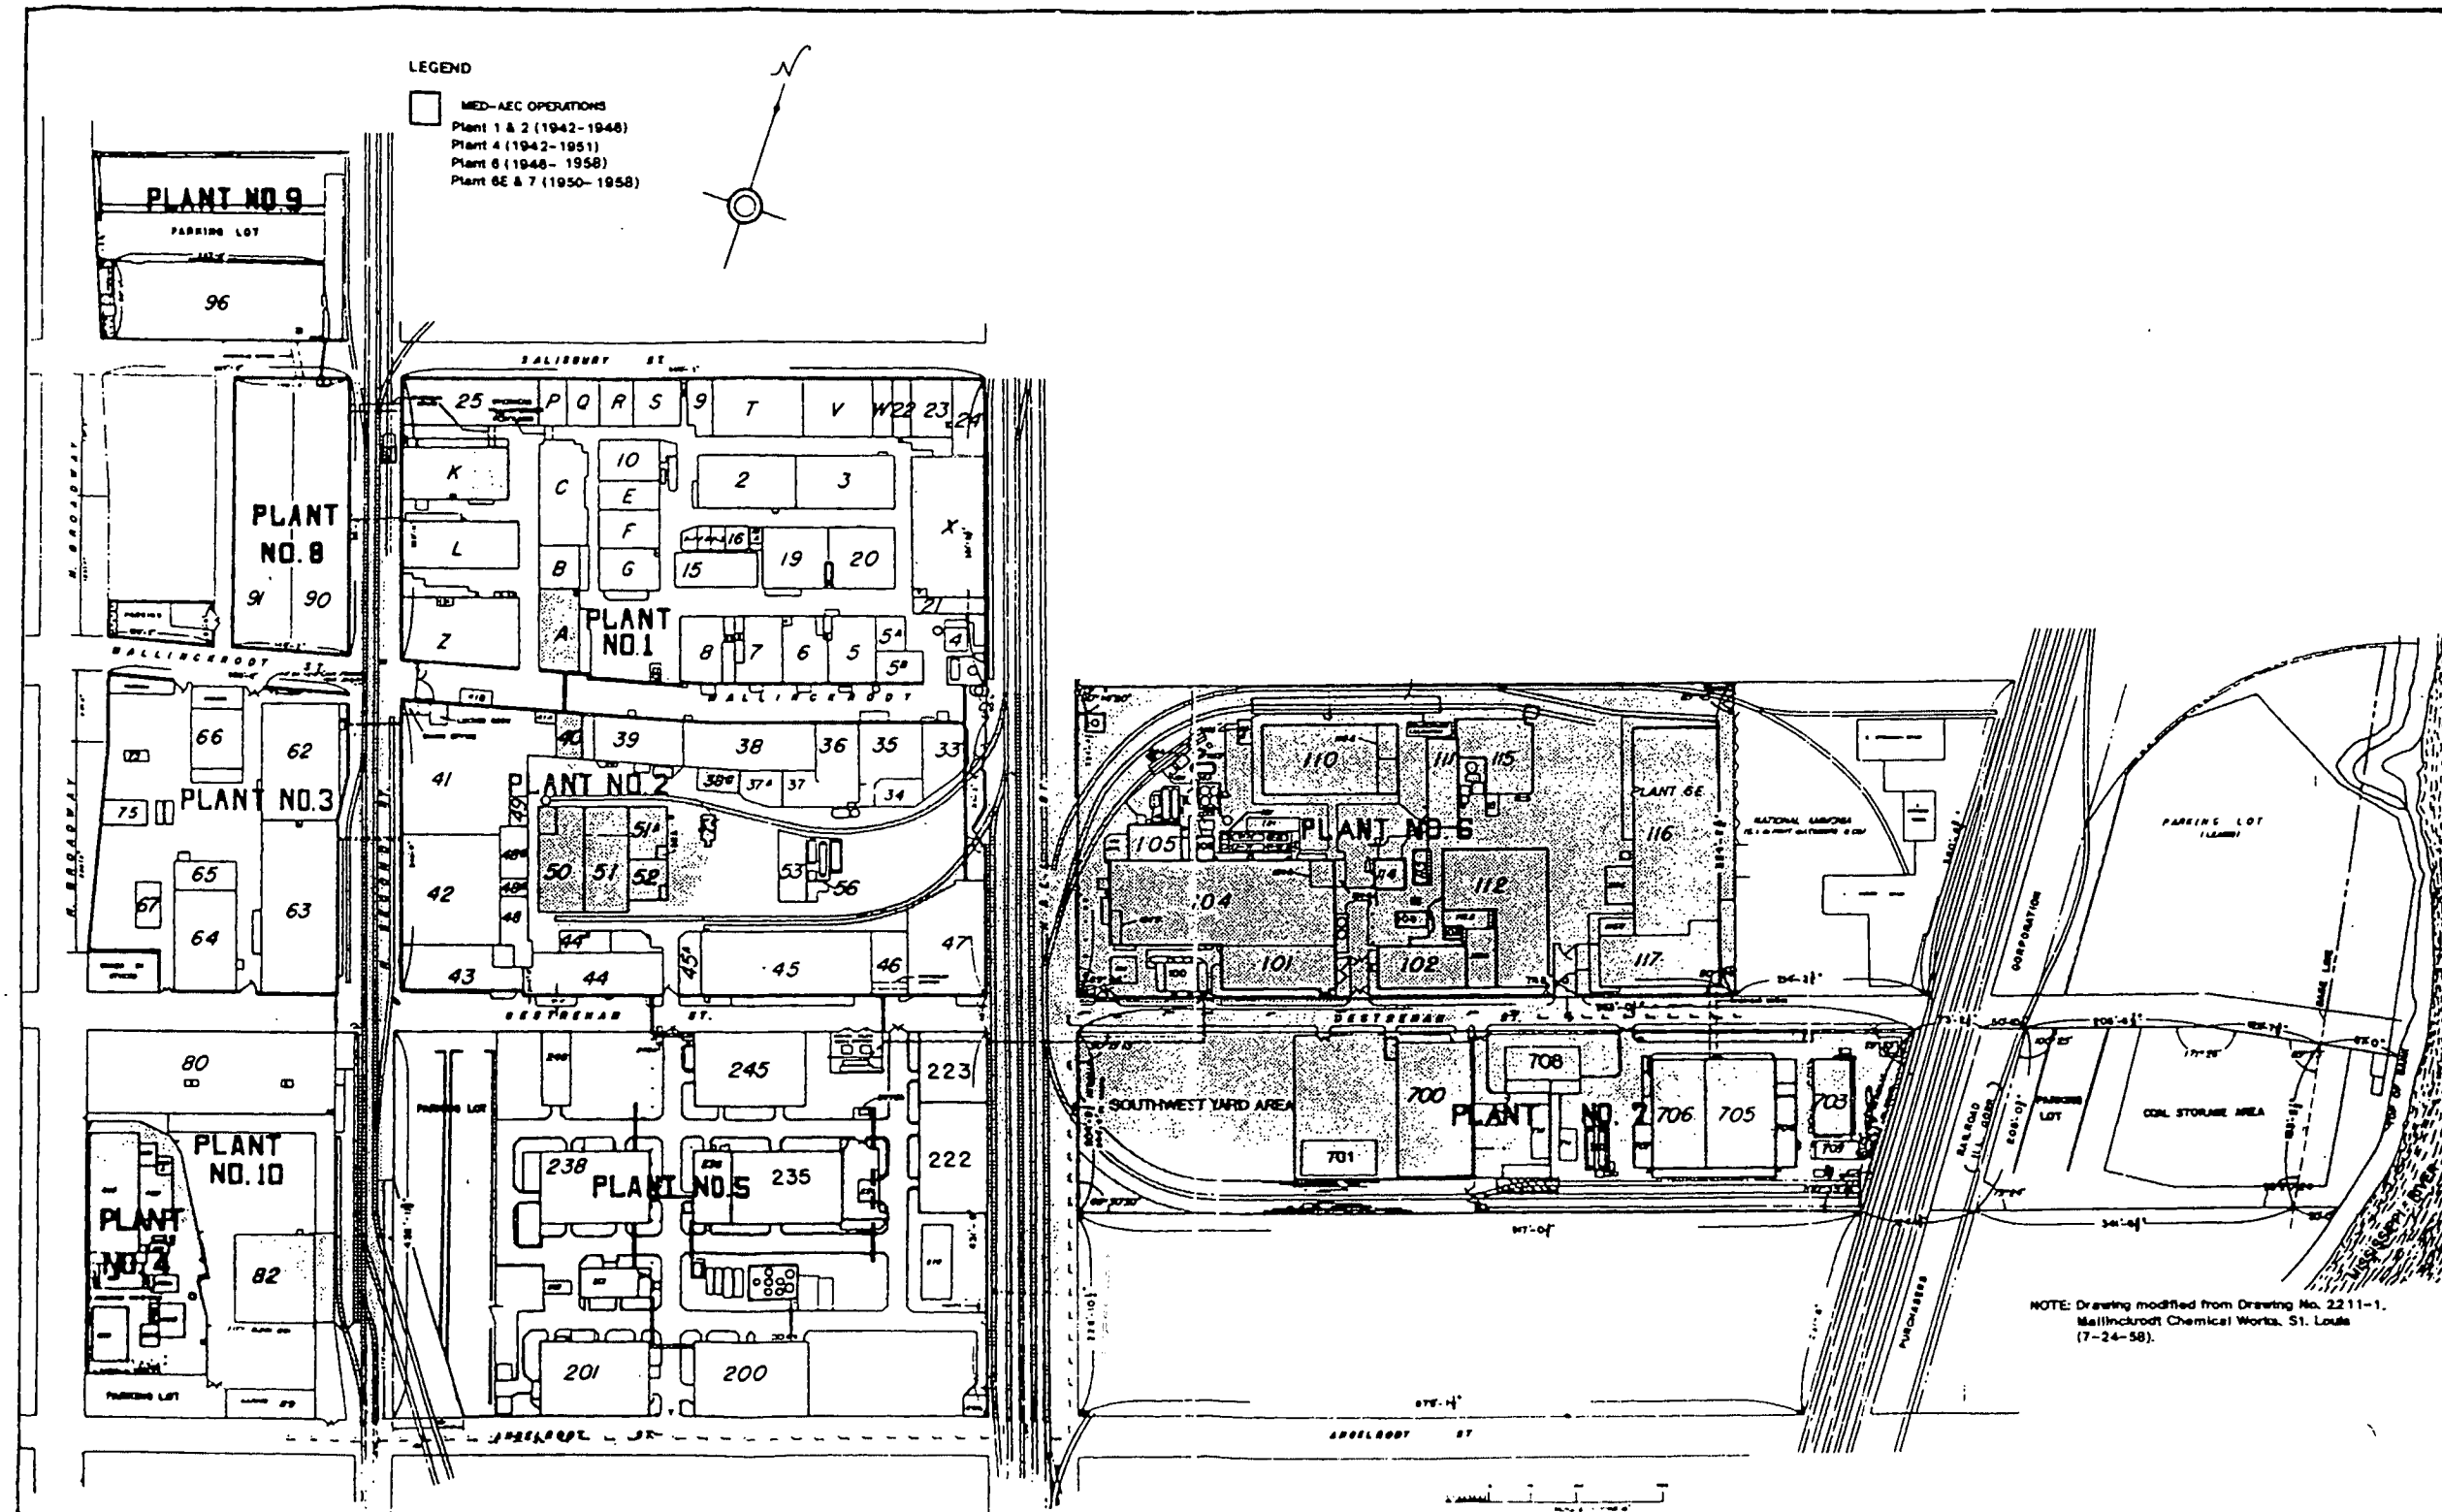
Historic Layout (1958) of the MED/AEC and Mallinckrodt Plant Facility
